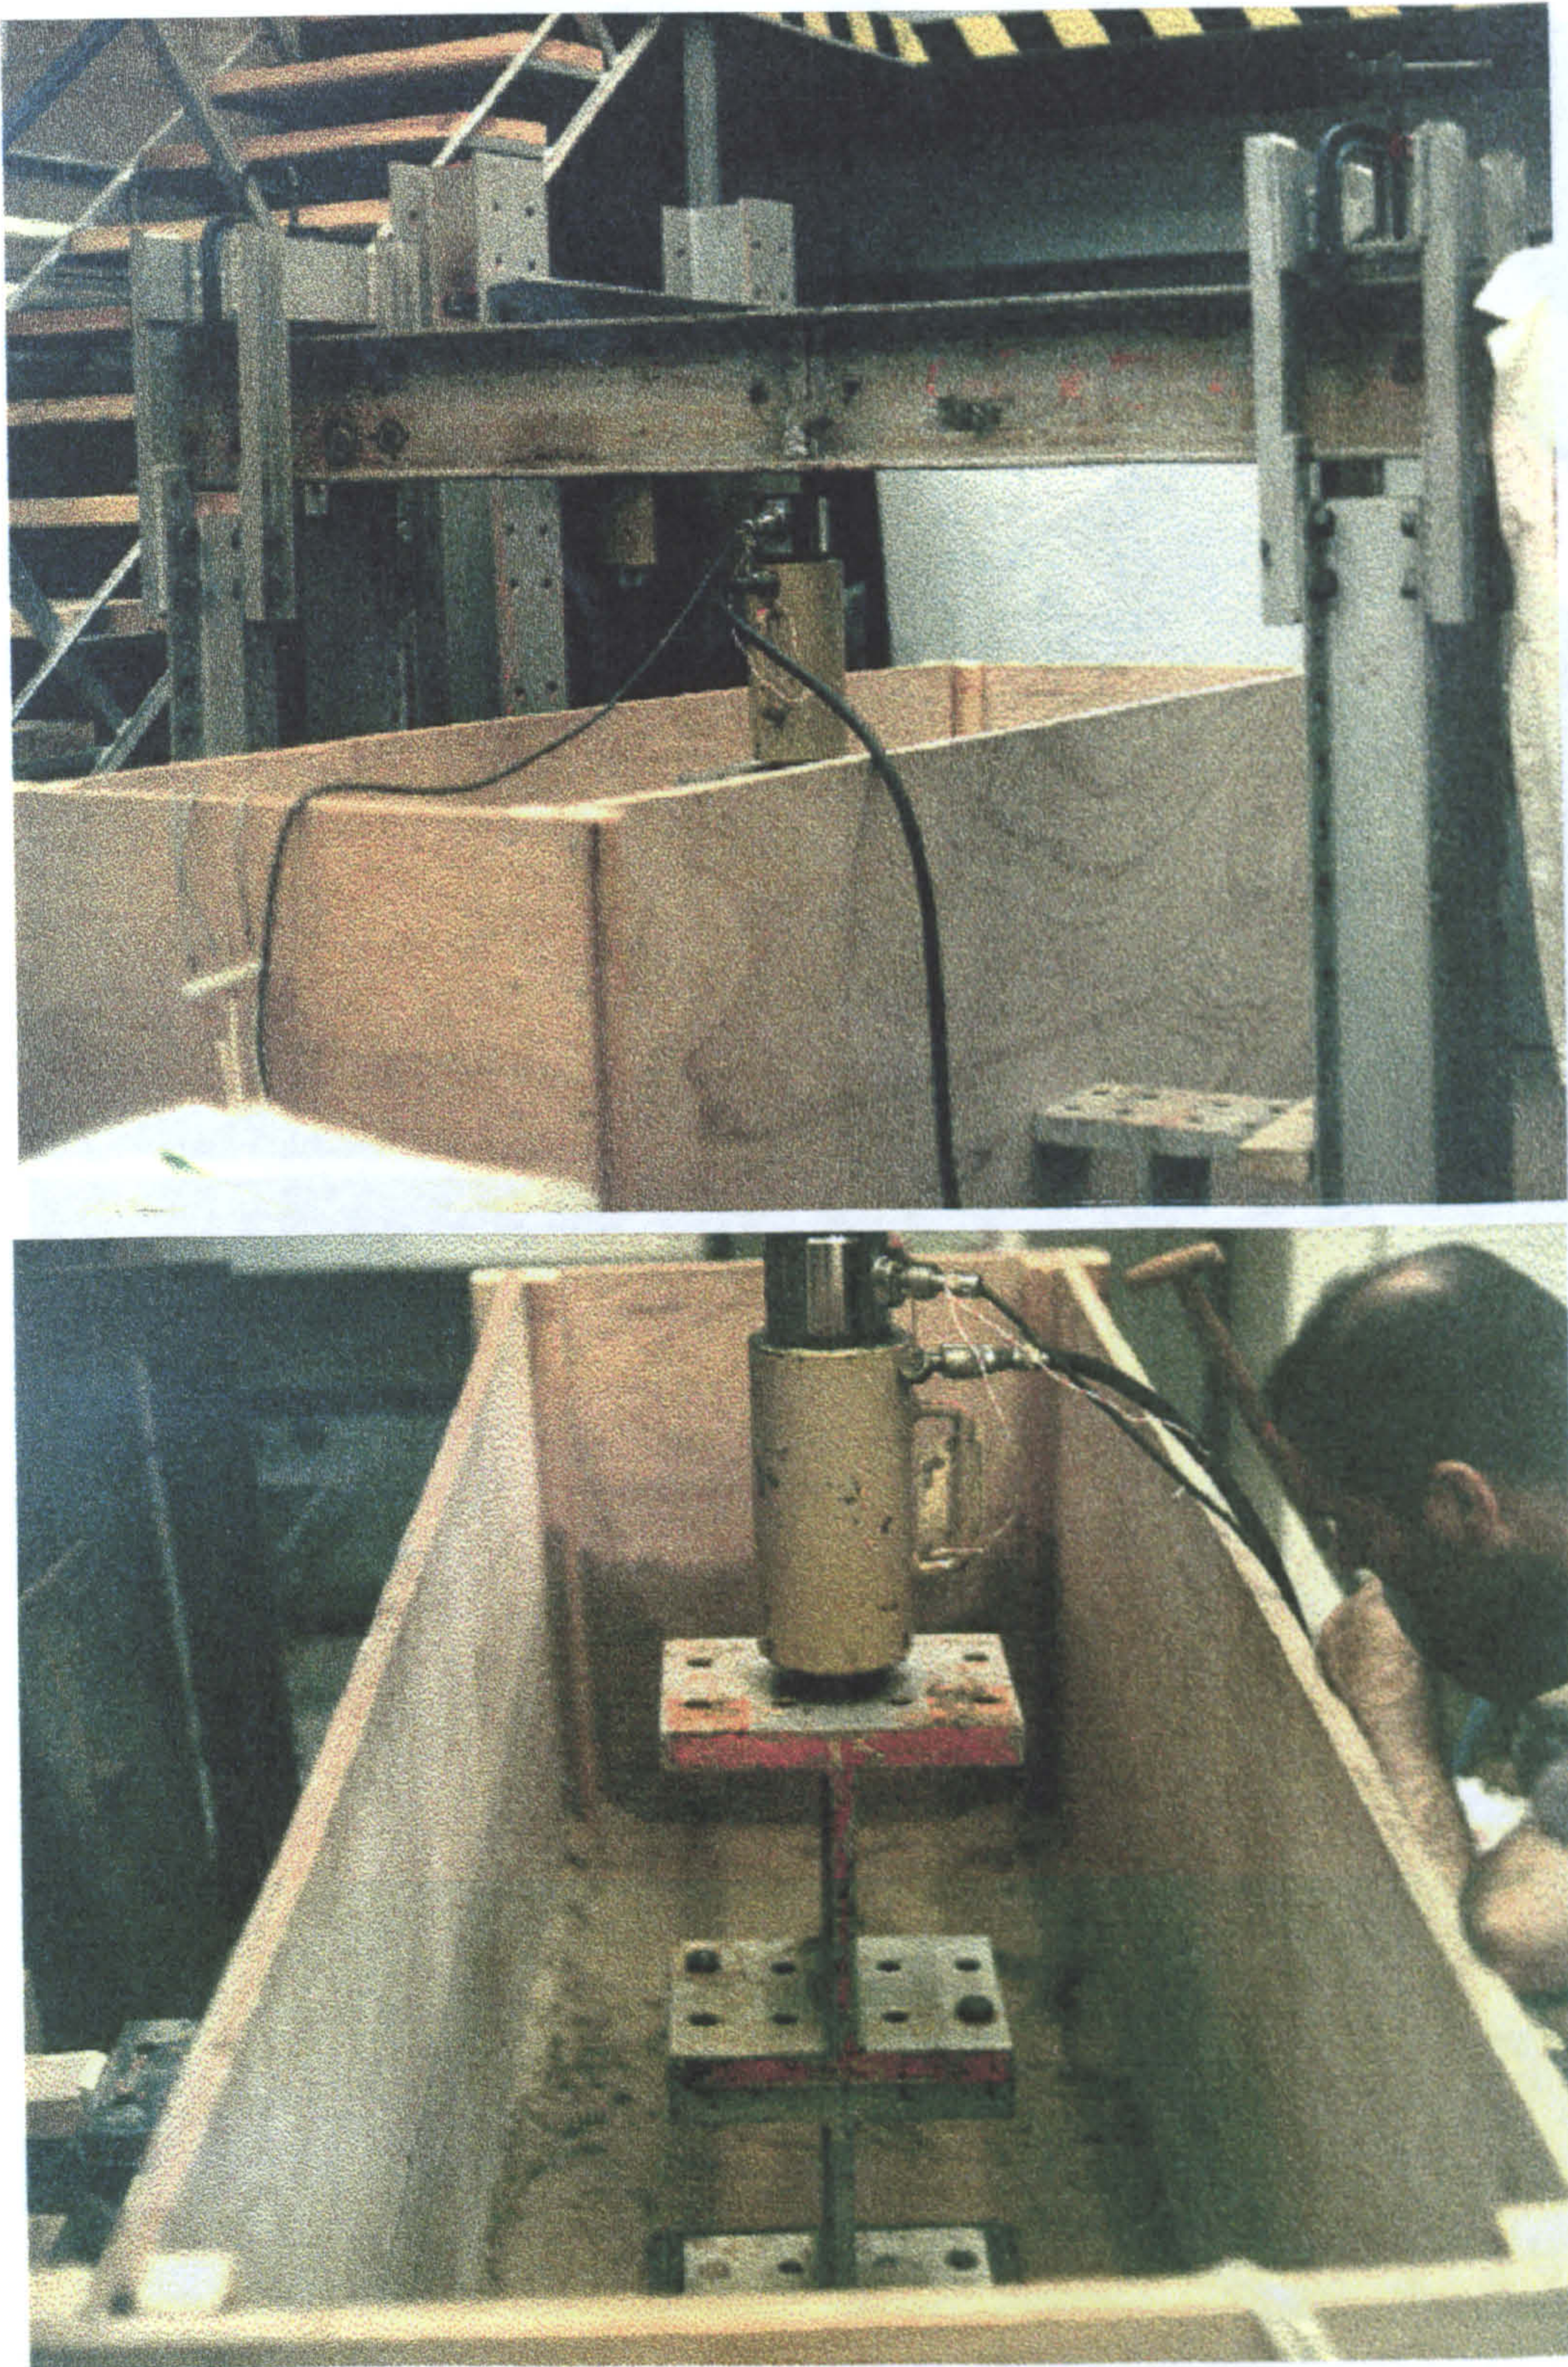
Plate-load test showing the radial plates and I-sections
